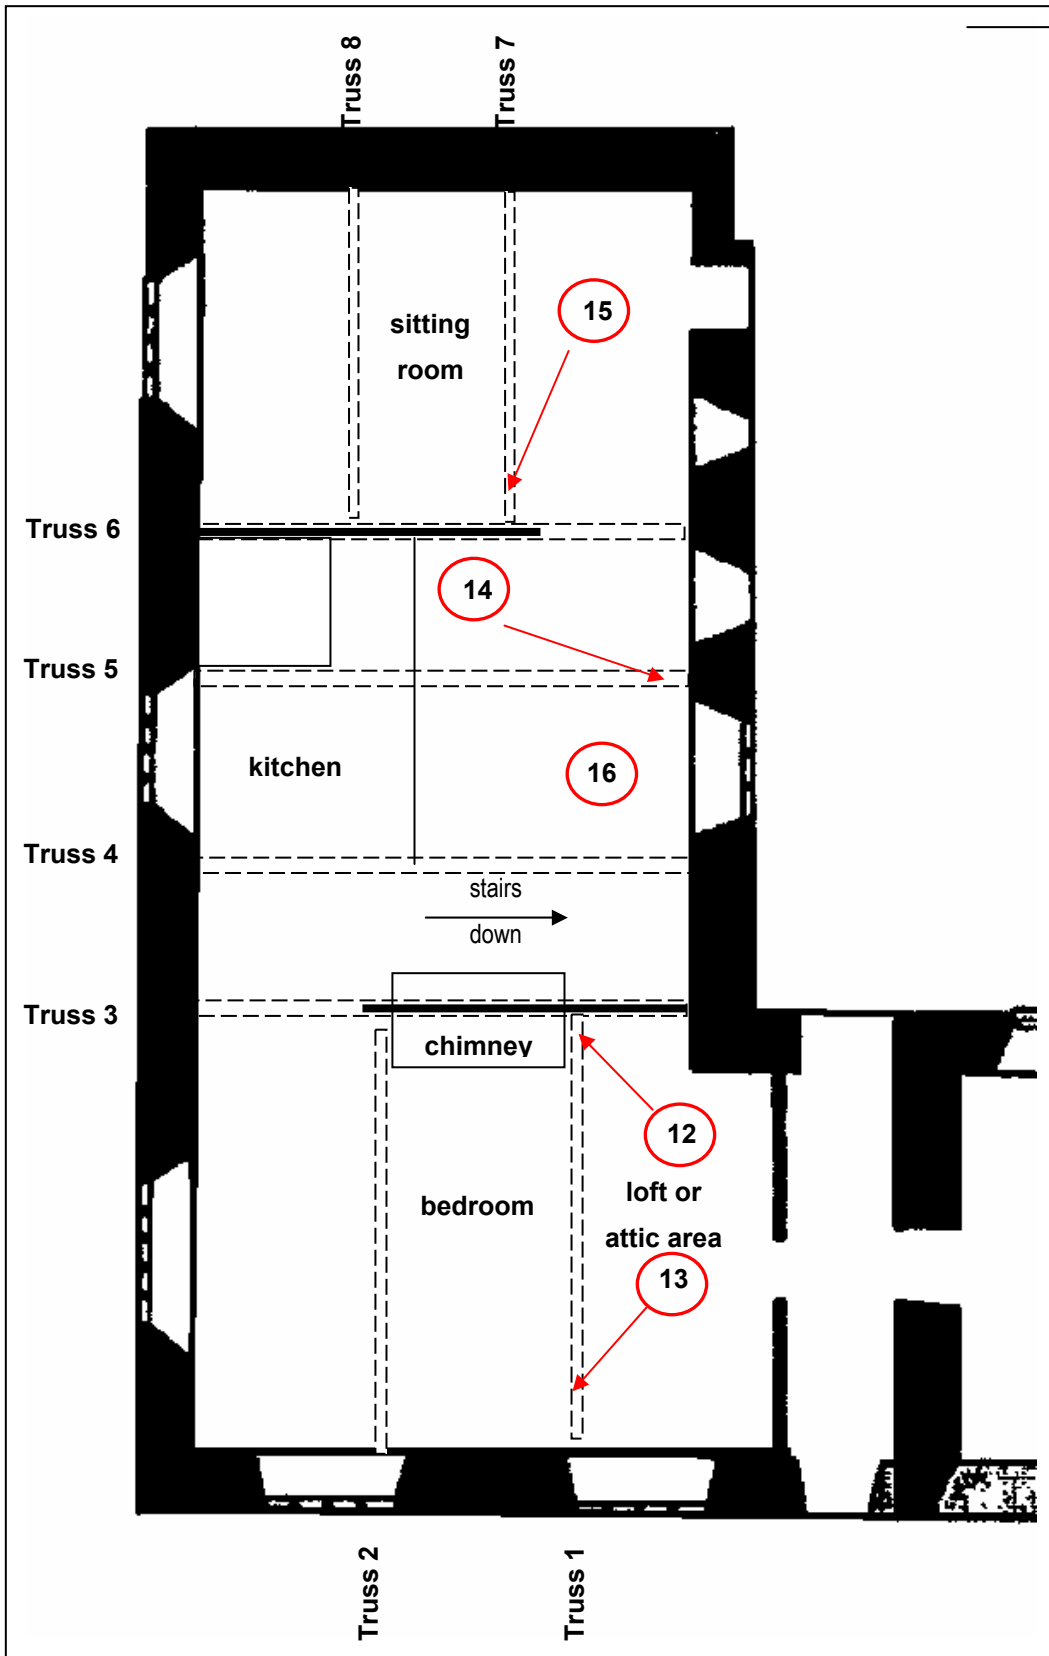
Pridhamsleigh manor (top floor level); plan to show approximate location of sampled timbers
